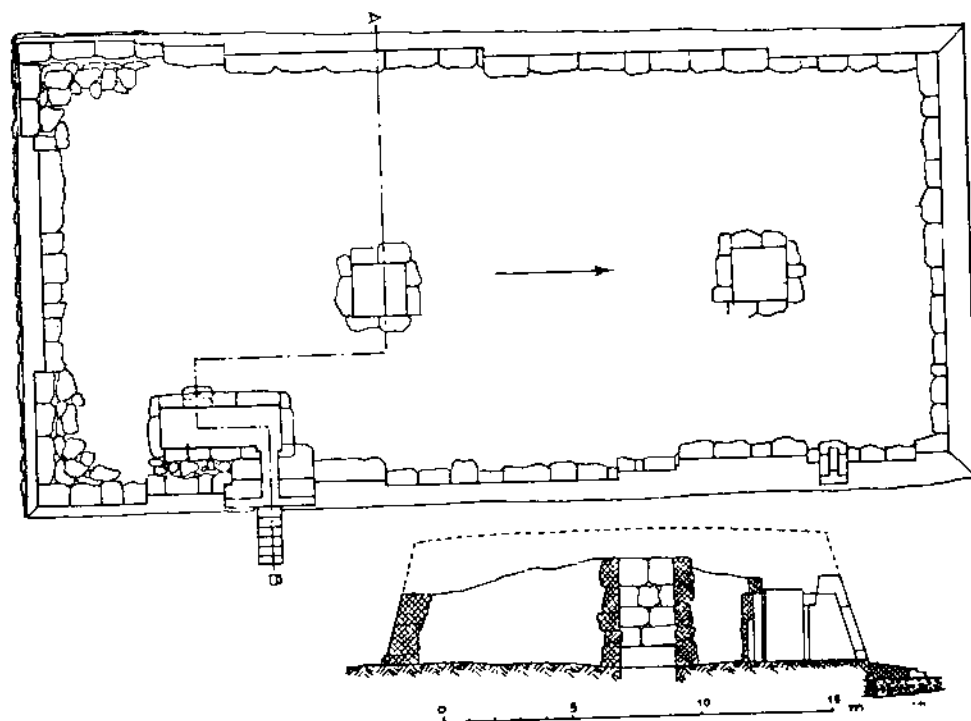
Plan and transversal section of the mastaba of Duwanhor (Giza, 7550).
